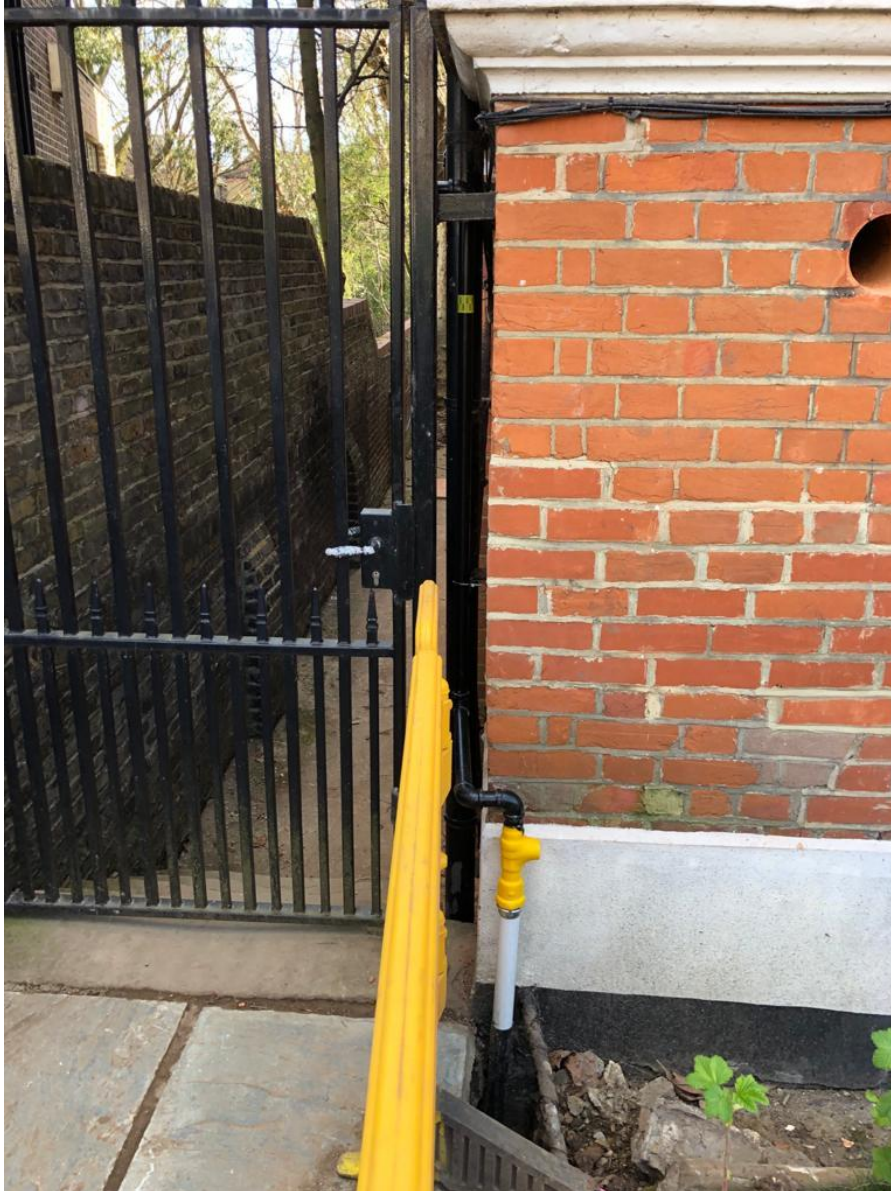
Photo of completed installation to the eastern corner of the north (front) facing elevation. Please note the same extent of installation is mirrored at the western corner of the north (front) facing elevation.
